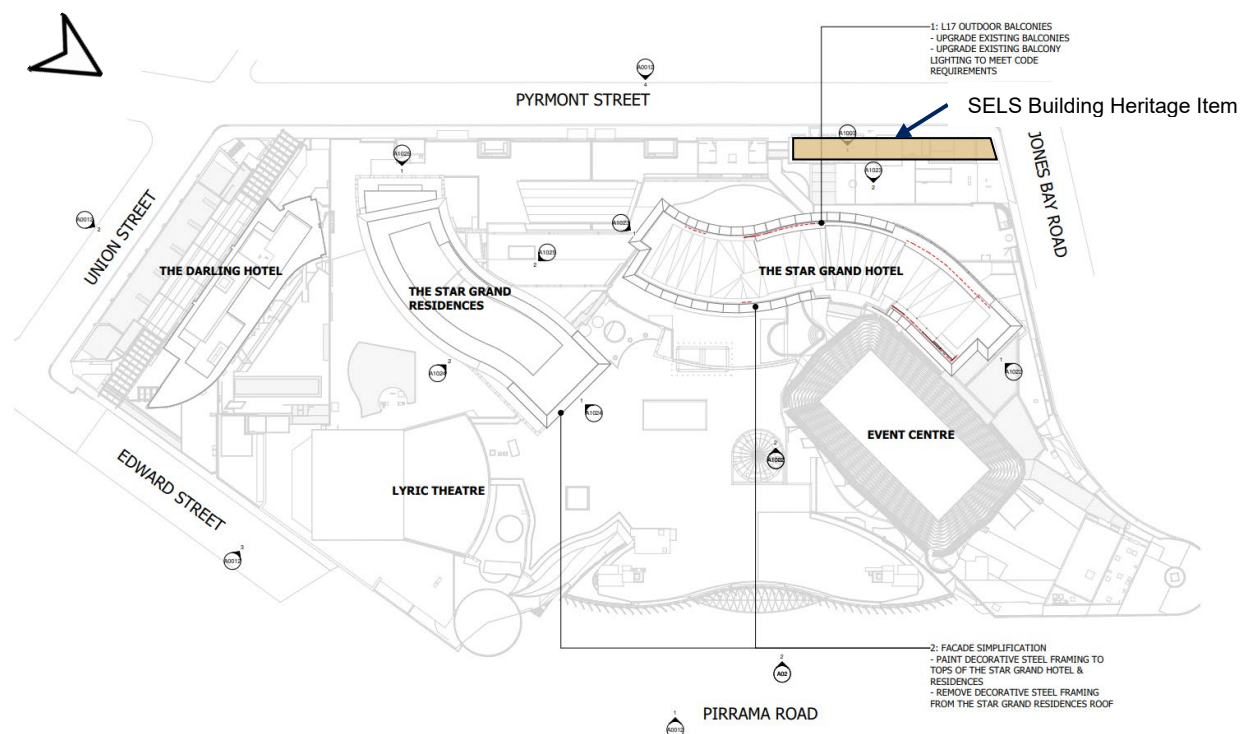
| Location of proposed modifications (Source: Architectural Plans)
